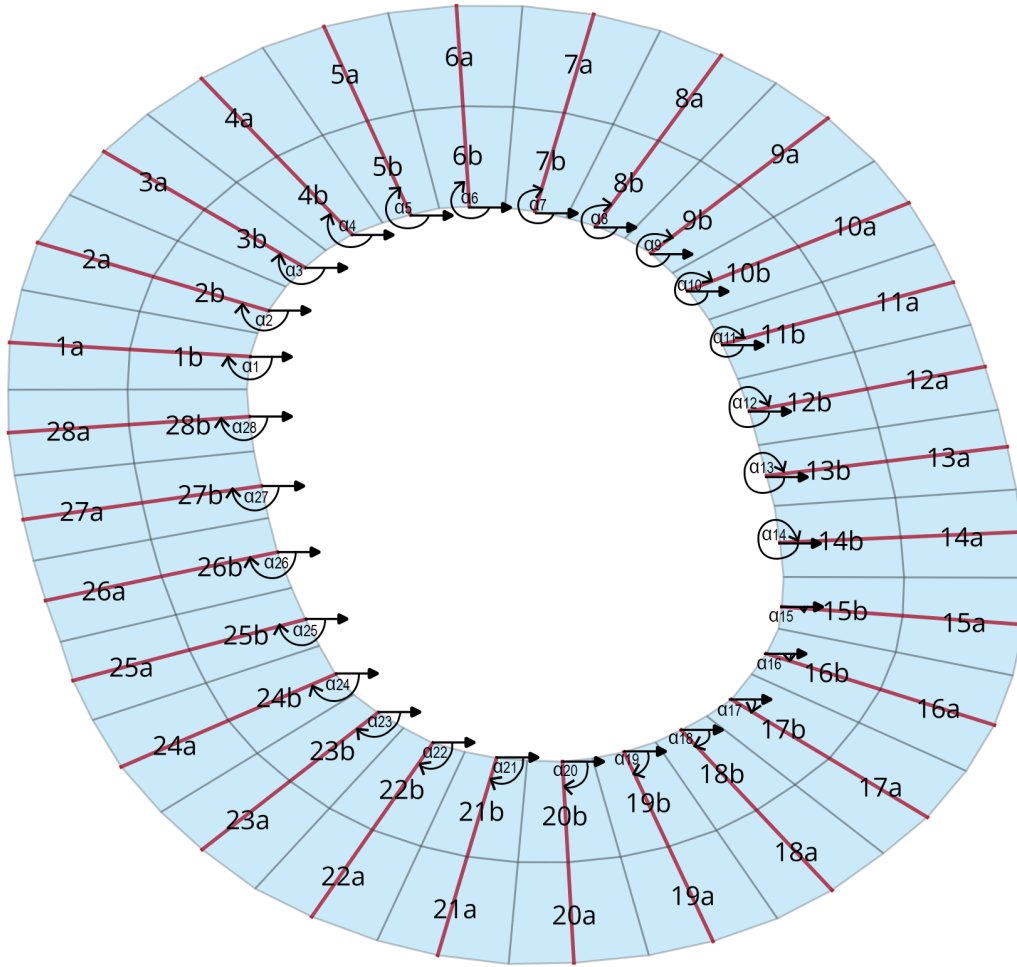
The truss orientation angle α_{Beam} for the 28 roof zones.
